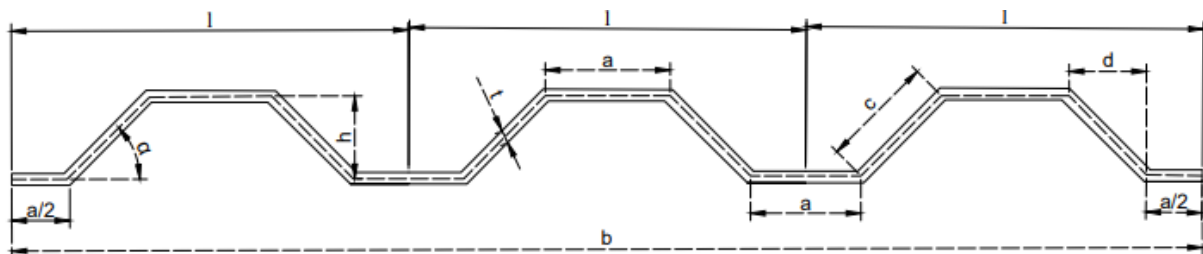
Cross Sectional Dimension of the Trapezoidal Corrugated plate
